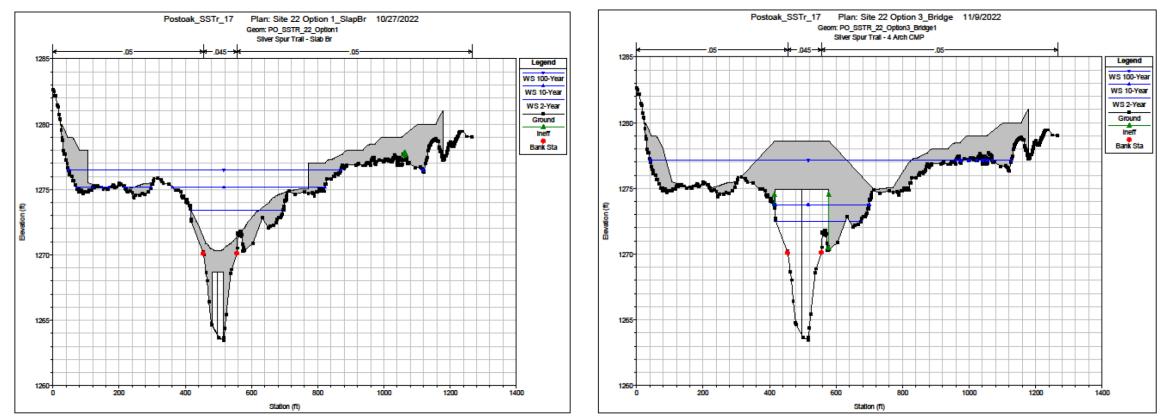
Cross-section of slab span bridge structure with water surface elevations.
